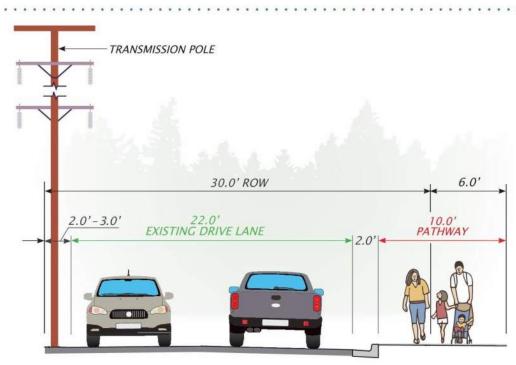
Alternative 4 W. 32<sup>nd</sup> Avenue typical cross sections.
